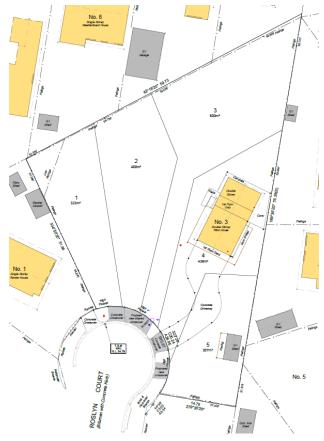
Proposed Plan of Subdivision – Land Surveys
